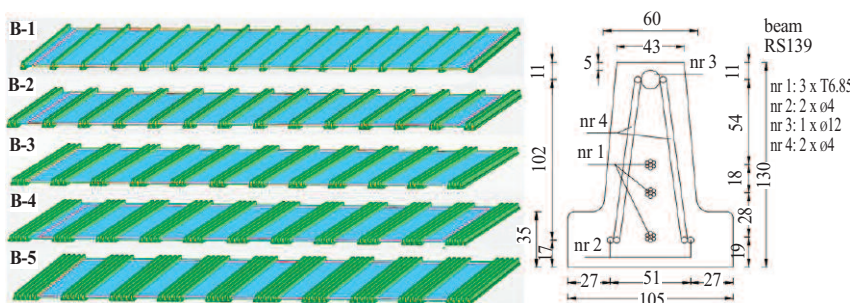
The calculation model 3D of a densely ribbed ceiling with RS139 prestressed concrete beams included in the rib: B-1 – one beam in the ceiling rib; B-2 – two beams in the ceiling rib; B-3 – three beams in the ceiling rib; B-4 – four beams in the ceiling rib; B-5 – five beams in the ceiling rib. Dimensions of the RS139 prestressed concrete beam
